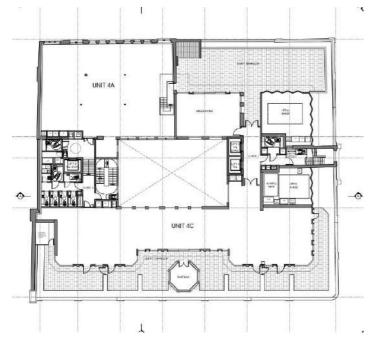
demolition drawing showing Building A retained at L04 (2311-EMR-Z00-004-DR-A-70206) and L04 of the Proposed Development (TCB-EMR-Z00-004-DR-A-02106) demonstrating minimal new office space construction.
